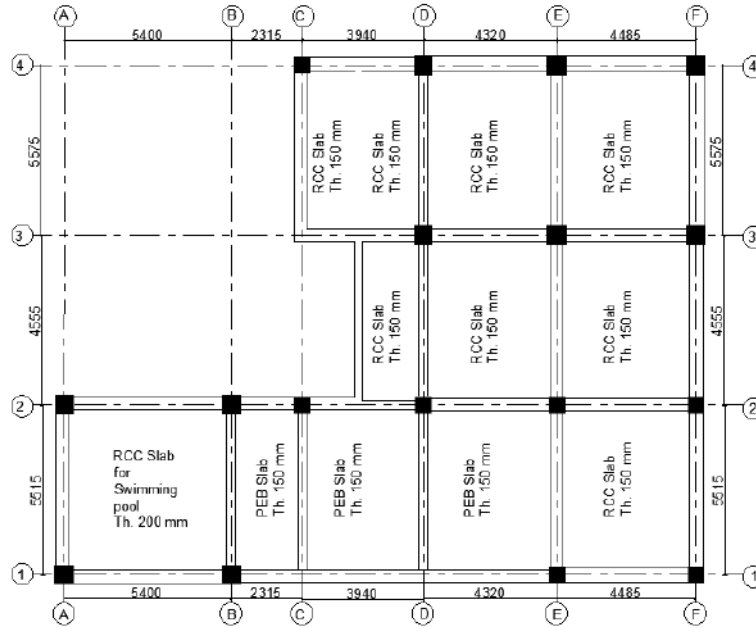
Schematic representation of the slab plan at the G+2 floor level above Columns A1, A2, and B1 where 2 ISMC sections installed as columns
